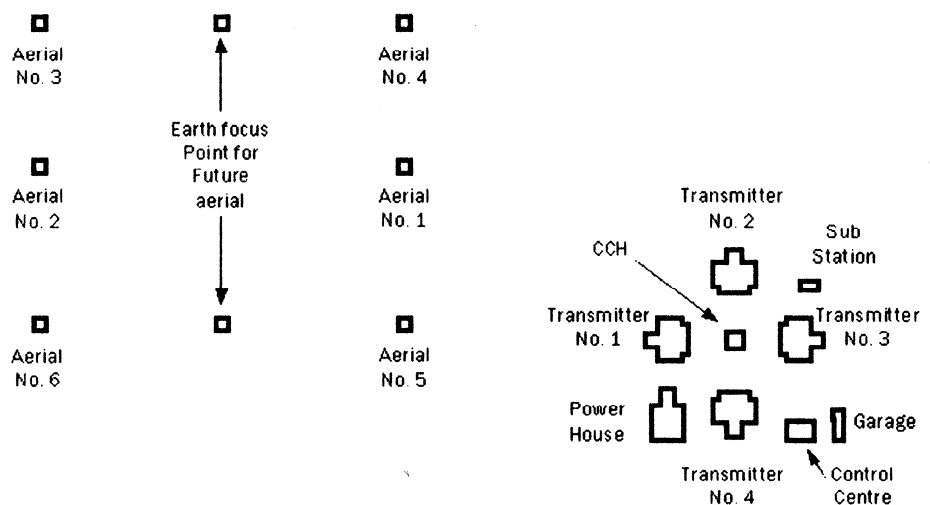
Ottringham site plan. CCH stands for 'Central Combining House'
